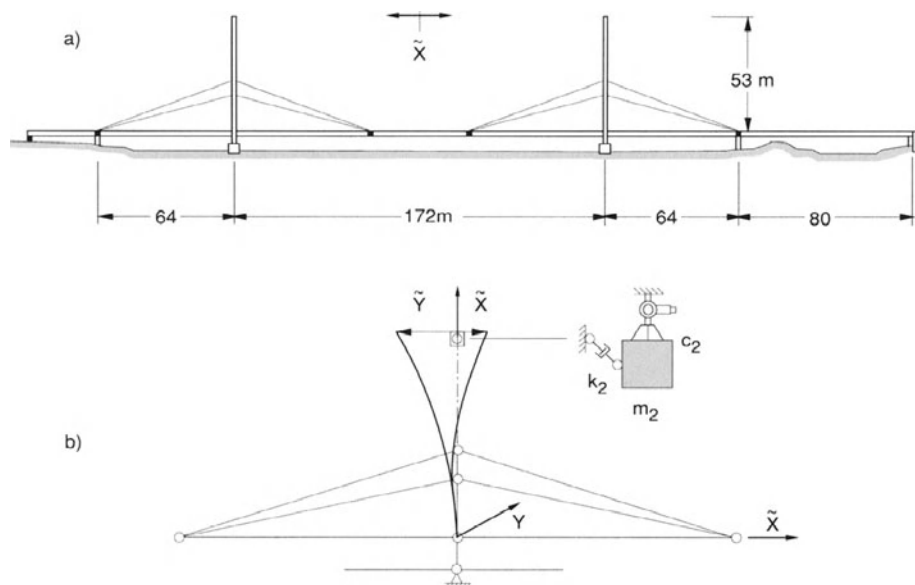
Cable-stayed bridge: a) overall system, b) pylon with vibration absorber
